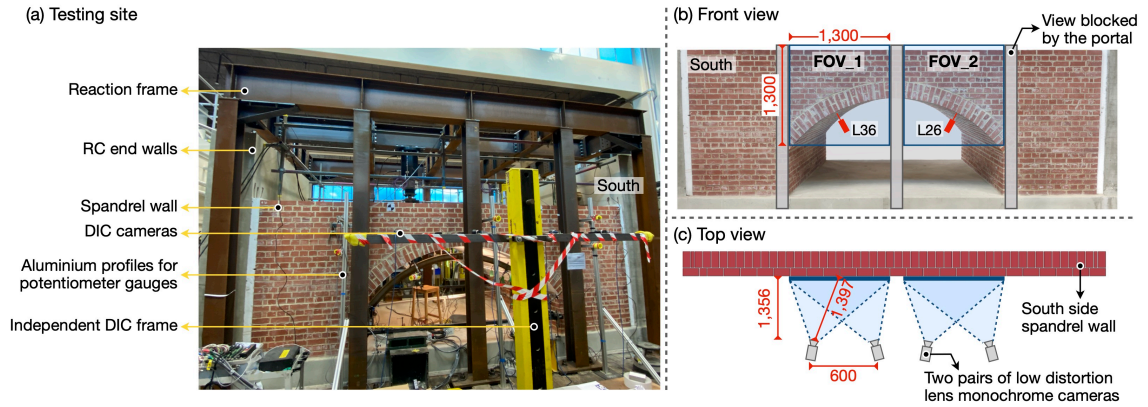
Experimental setup (all units in mm): (a) testing site; (b) Front view of the south-side spandrel wall showing the DIC inspection area; and (c) top view showing the locations of cameras.
